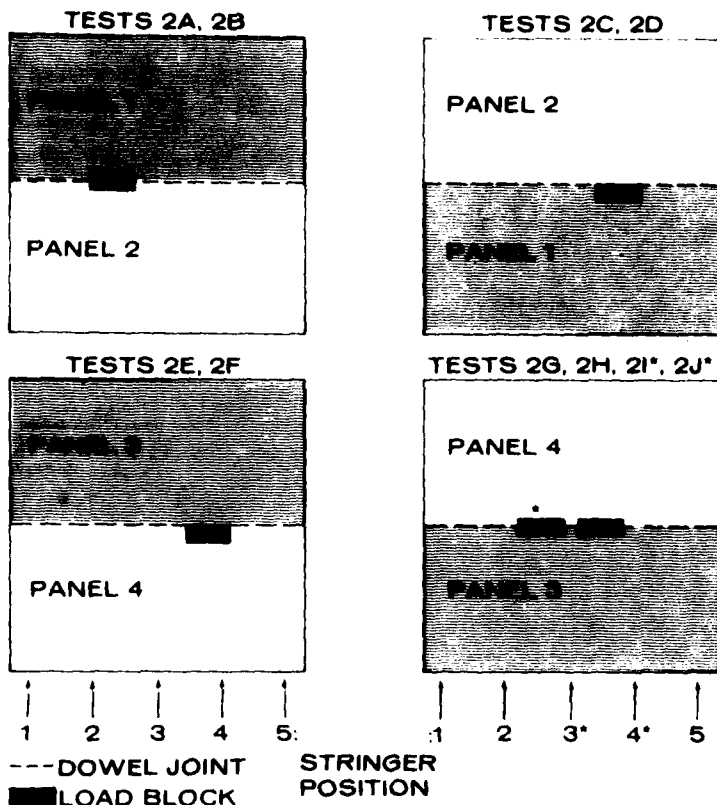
Deck panel configurations for Series 2 tests. Only stringers 3 and 4 were damaged in tests 2G and 2H. These stringers were replaced and two additional tests were performed (2I, 2J) with panels in the same configuration.
